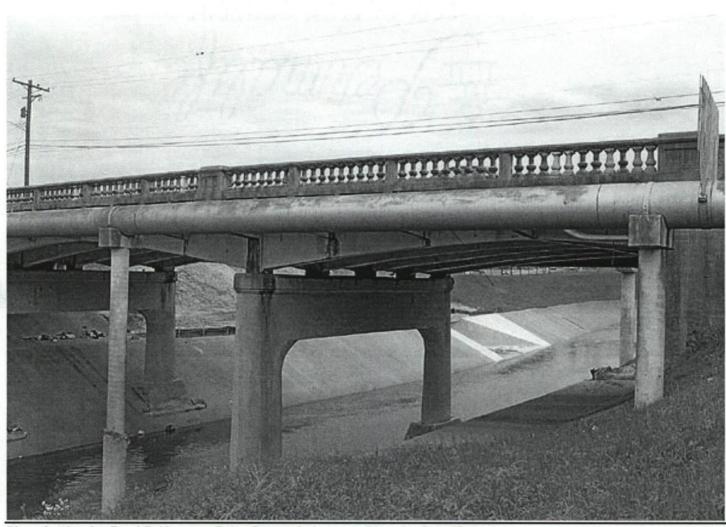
Almedea Road Bridge over Brays Bayou, facing east. Photo by Greg Harmon.
